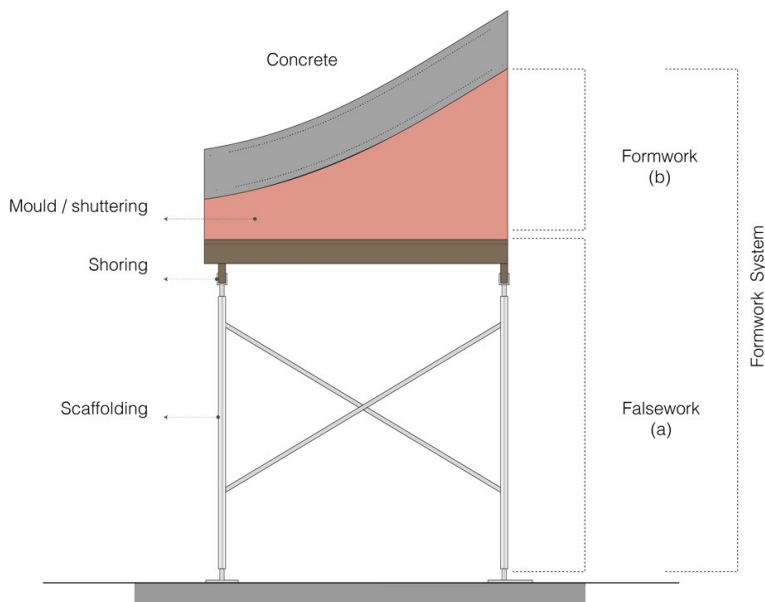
Typical formwork system components: (a) falsework comprised of scaffolding and wooden shoring; (b) formwork shuttering or mould.
